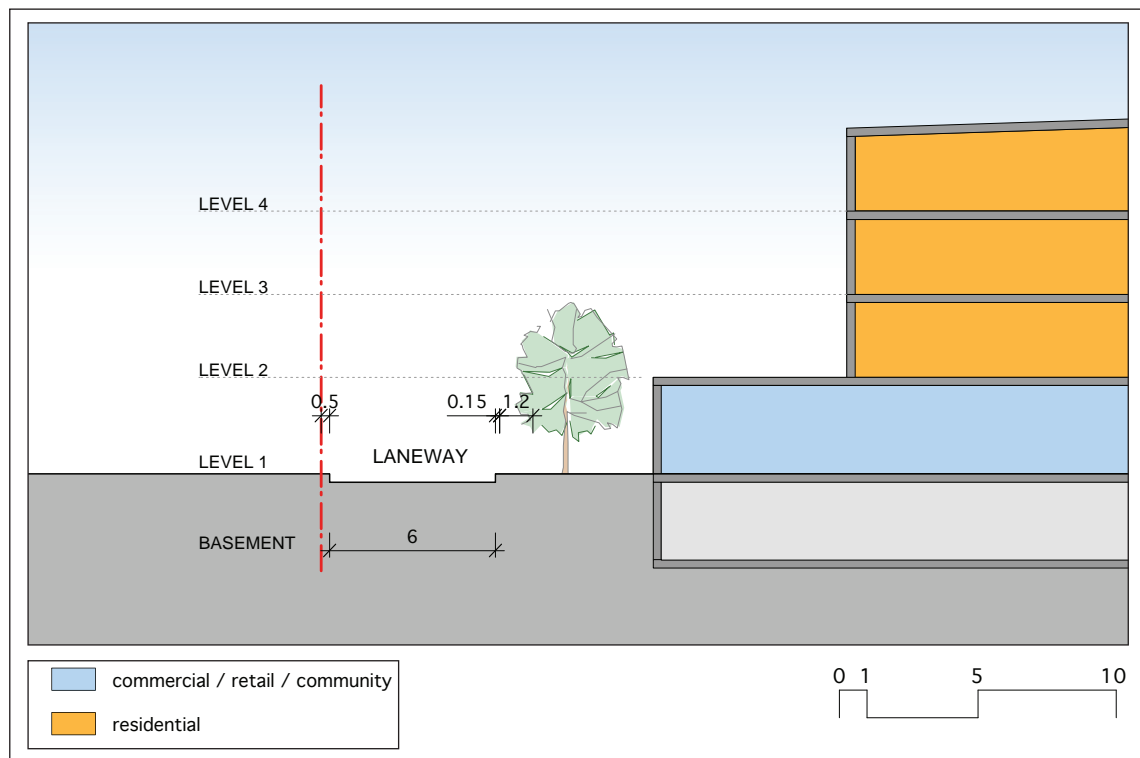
Blenheim Road Small Centre Laneway Section.
